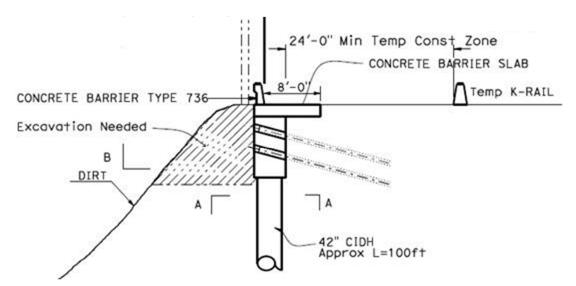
Schematic drawing of Alternative 2 – Ground Anchor Option.
